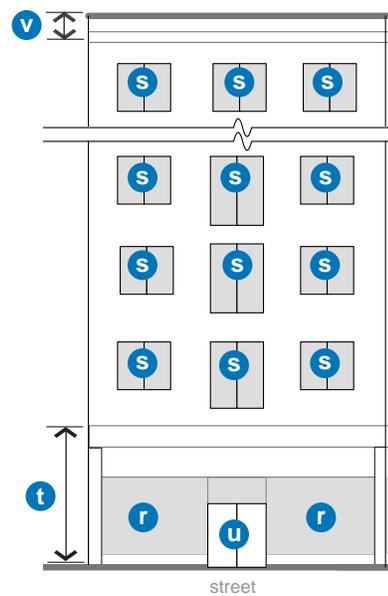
(3). Storefront Building: Street Facade Requirements.
